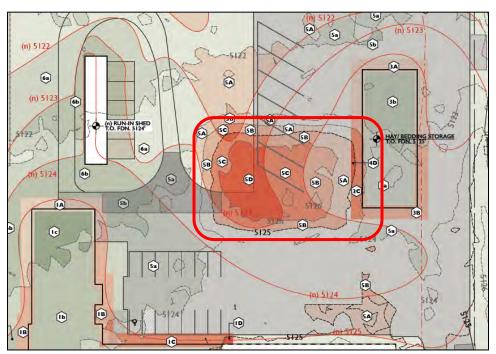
Detail from proposed cut and fill plan, with volume shading; proposed area of cut related to the existing septic system outlined in red.
